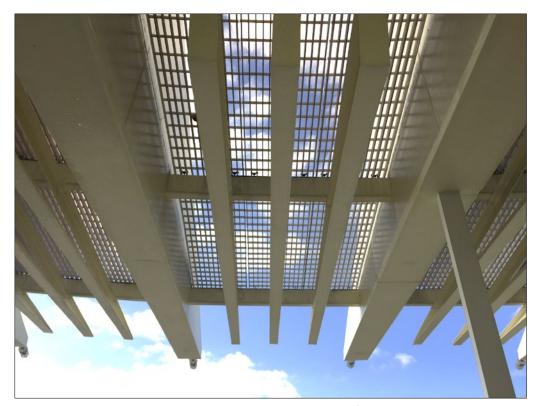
Pier 66 Hotel Tower. Crown outriggers. Camera facing up and northwest. Photograph taken October, 2017.
